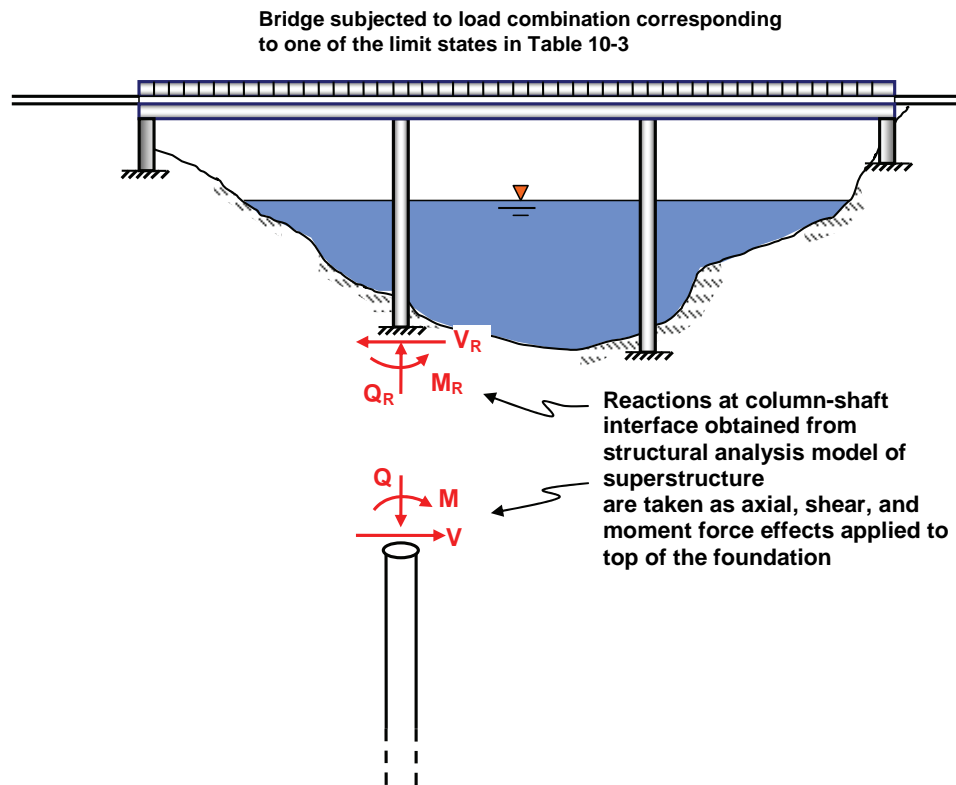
Structural Analysis of Bridge Used to Establish Foundation Force Effects
